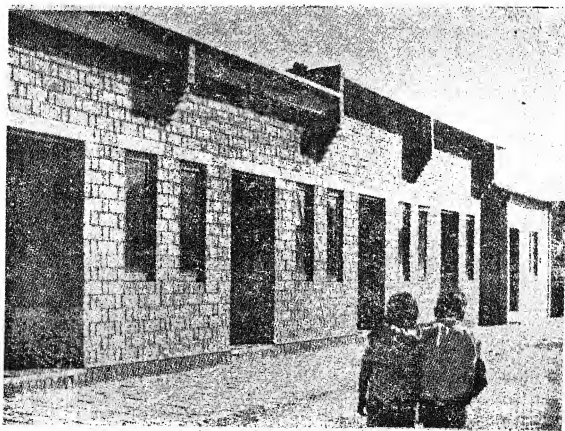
PHOTO NO. II PRECAST T-BEAM ROOF FOR LOW COST HOUSE
